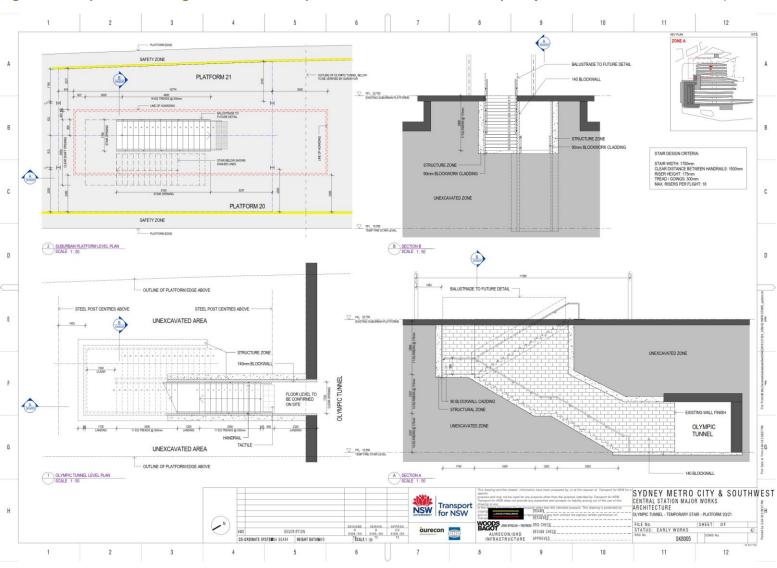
Proposed hoarding and initial 2m deep excavation for the future temporary staircase on Platform 20/21 (Source: Laing O'Rourke, 2018).
